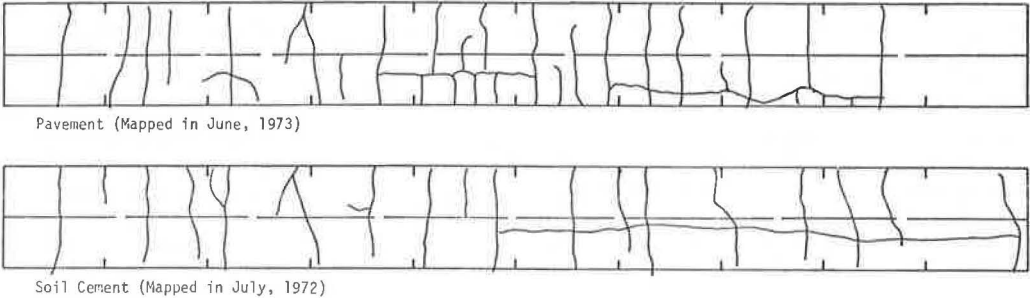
Cracking pattern of soil-cement base and superimposed pavement for experimental section with Type K expansive cement.
